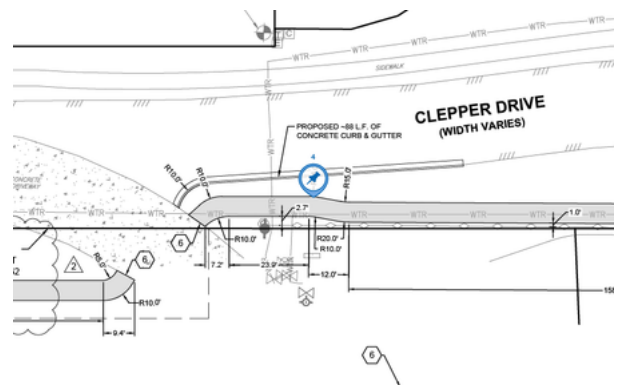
PAVING & DIMENSION PLAN Rev.0
